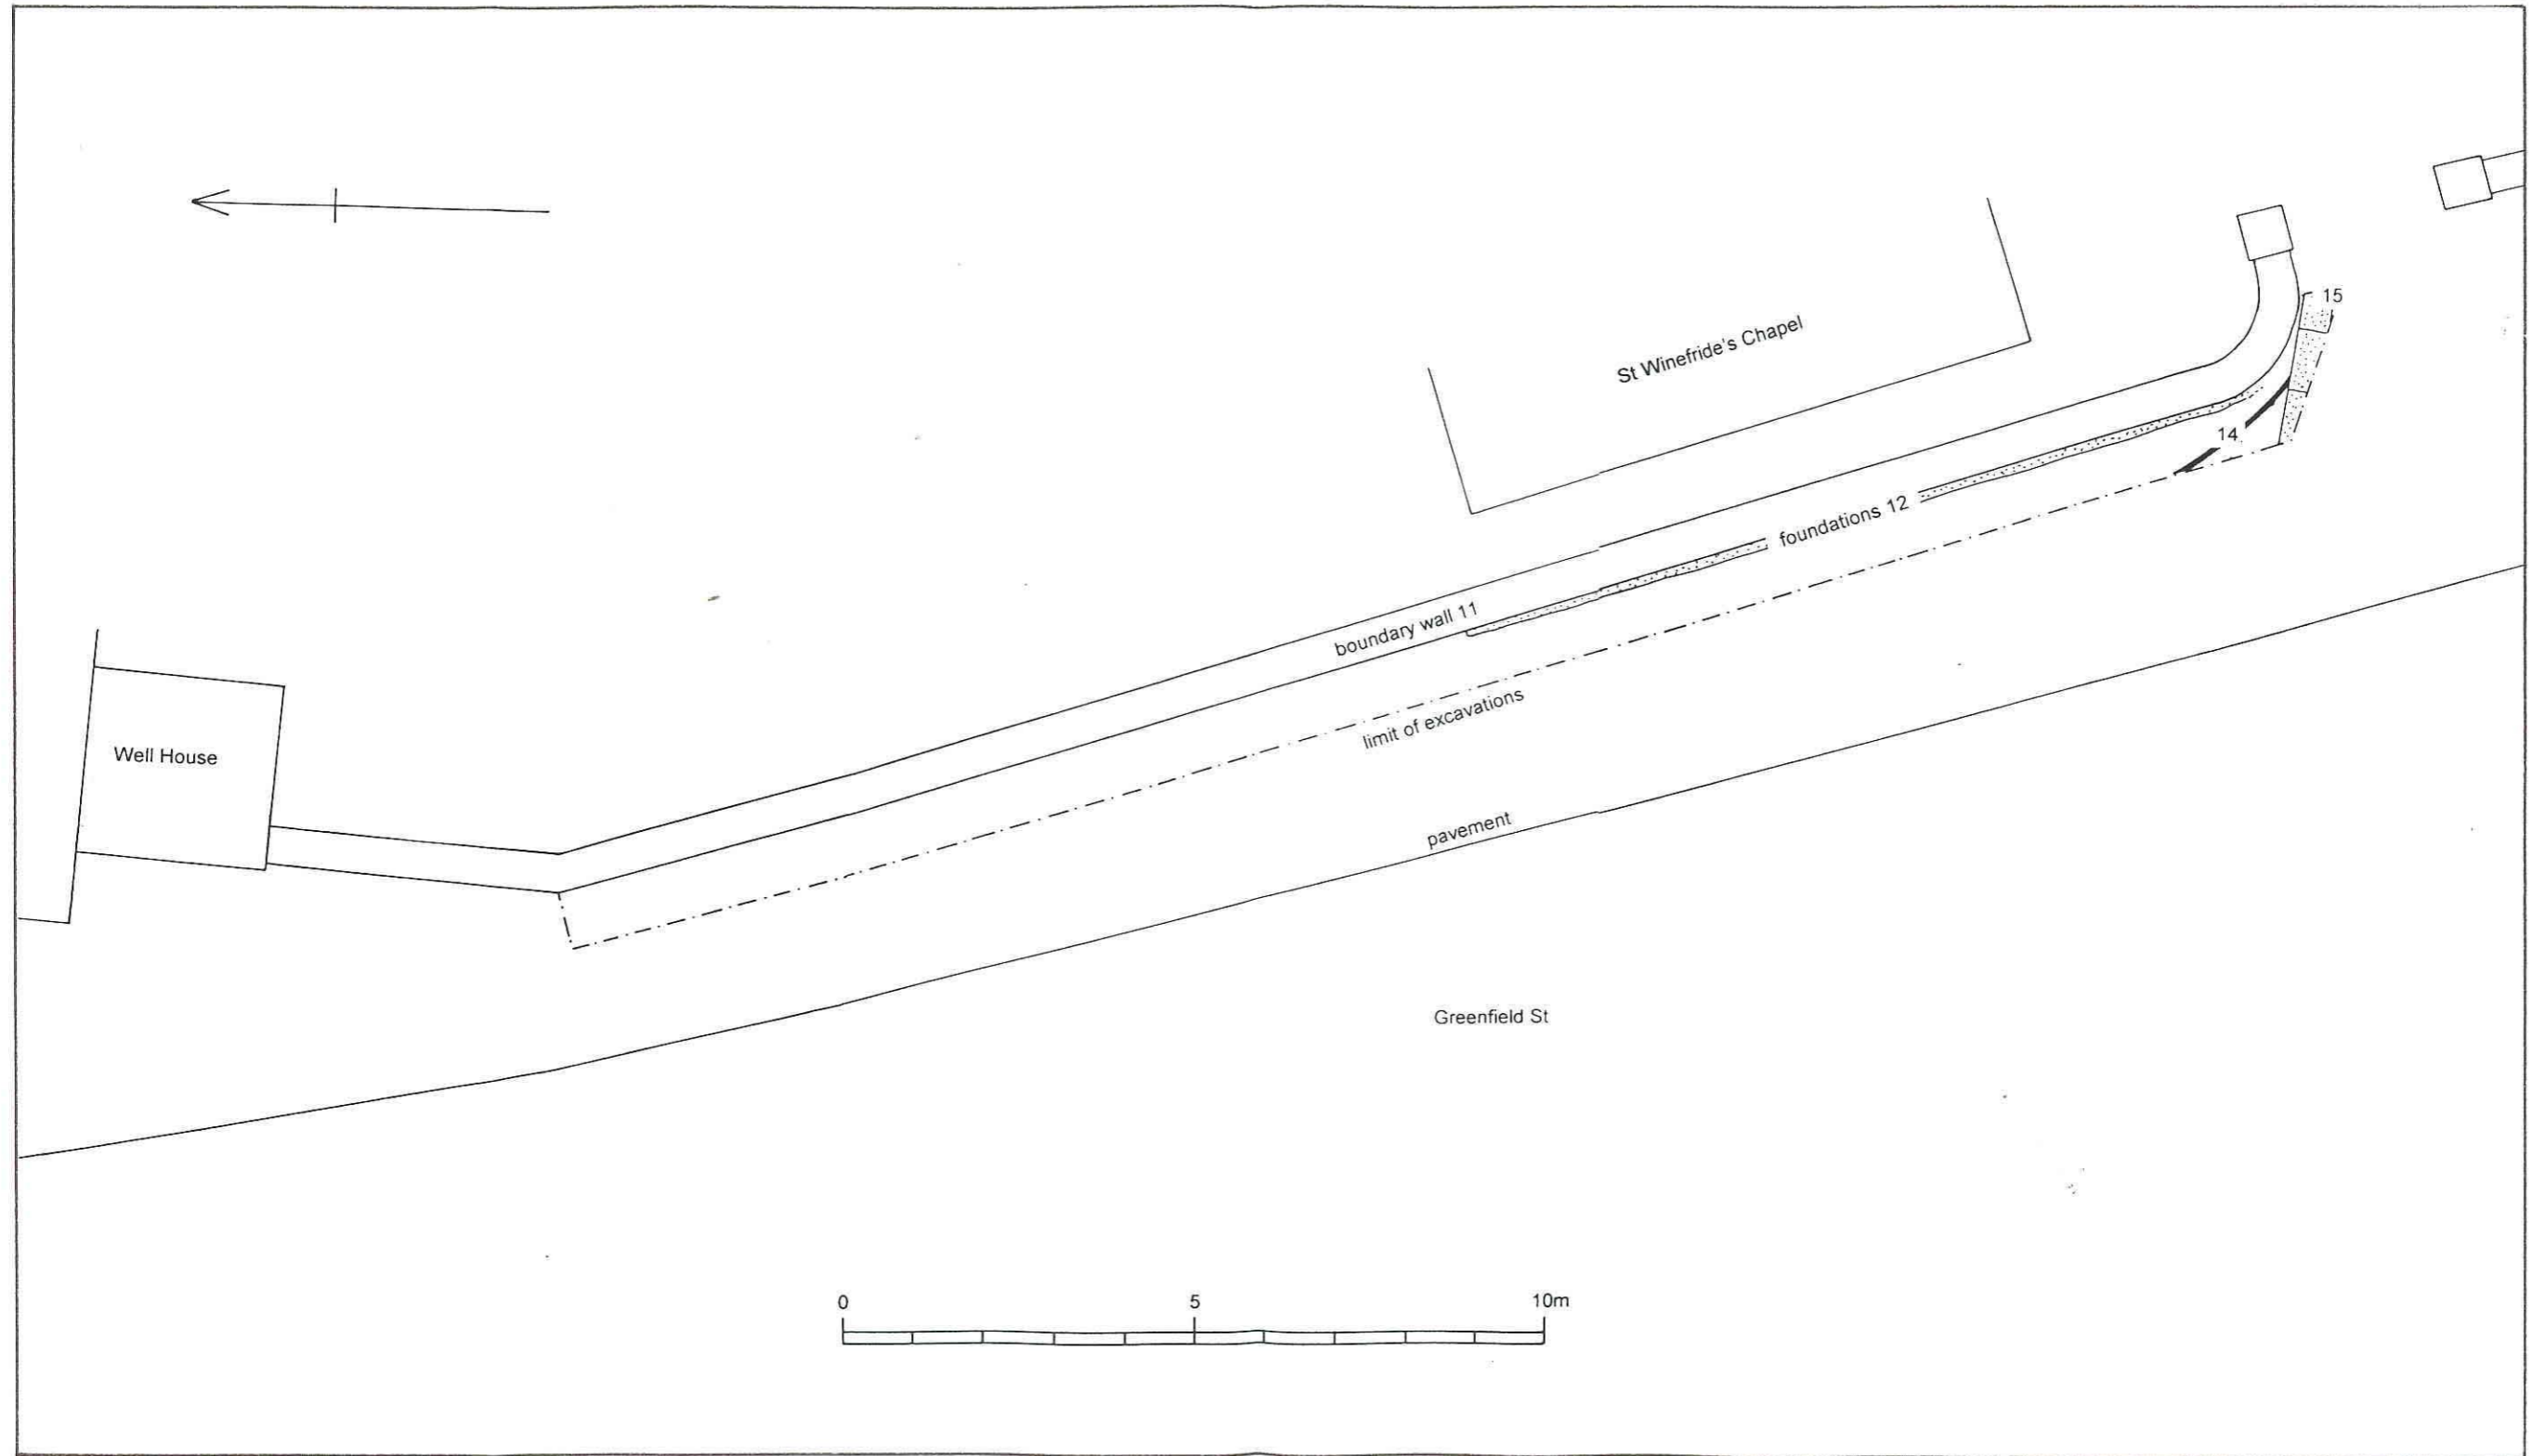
Excavation plan showing position of foundations (12). Scale 1:100
